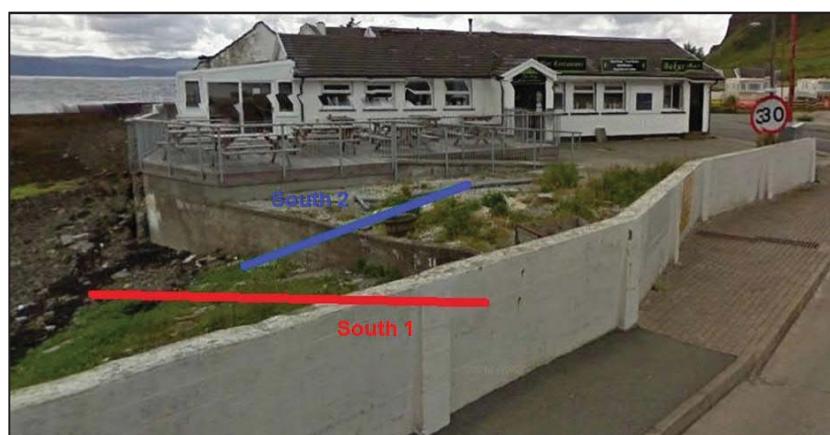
Cross sections for the existing ferry terminal (3D view)
